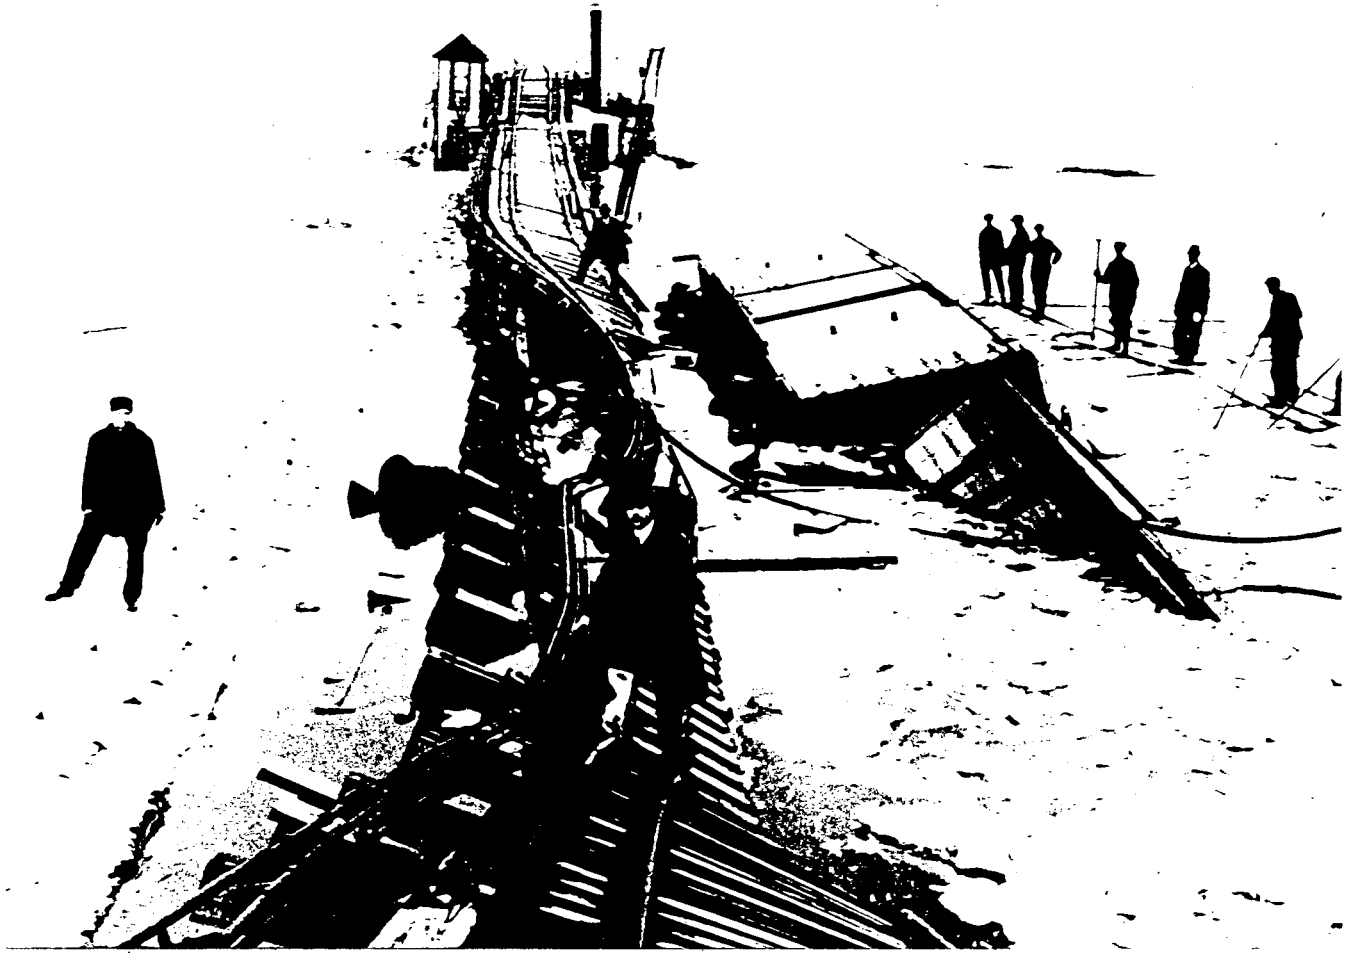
, 1918, accident to floating drawbridge. View is looking due west towards the New York shore.
